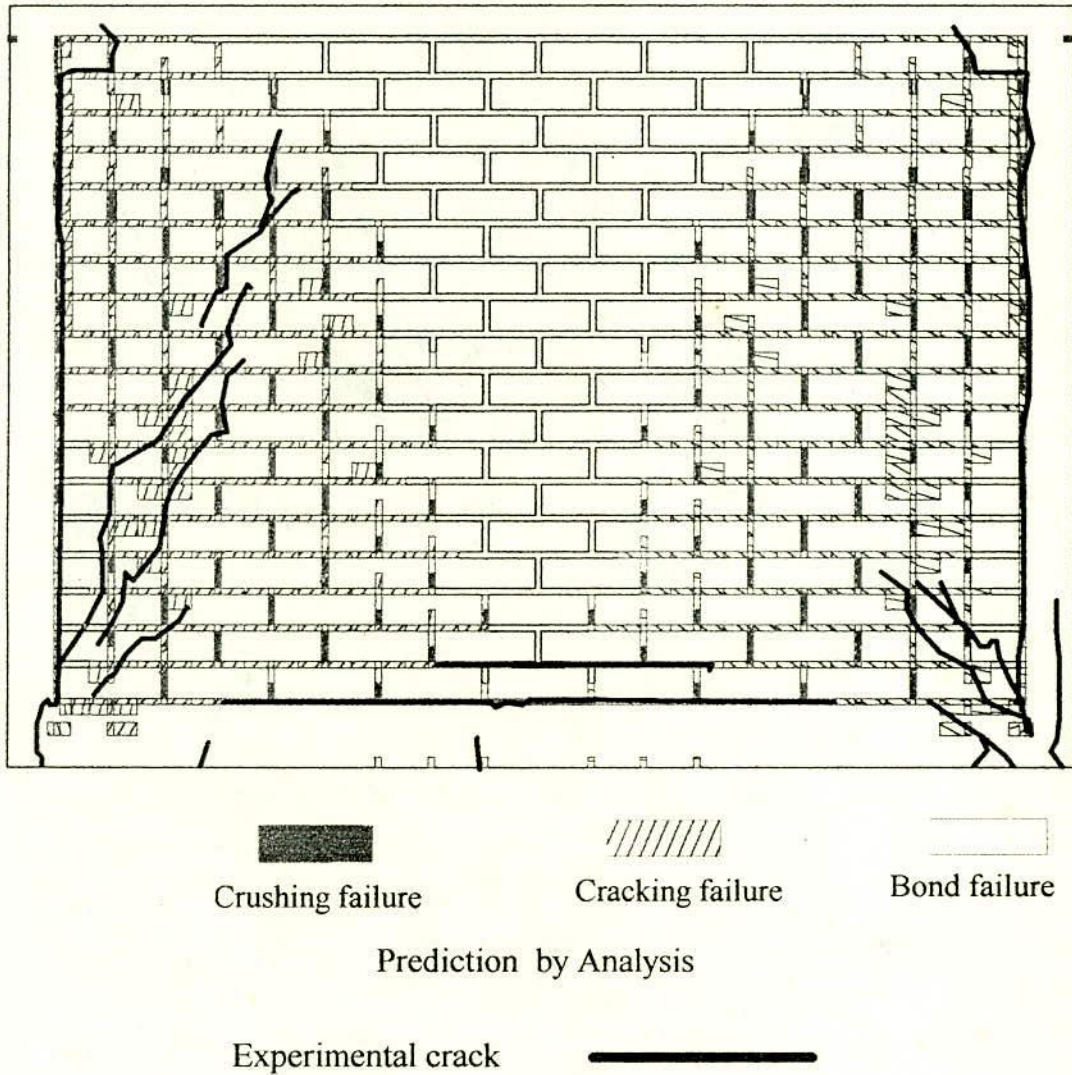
(b) Modes of Failure of Wall-beam Panel with Frame
